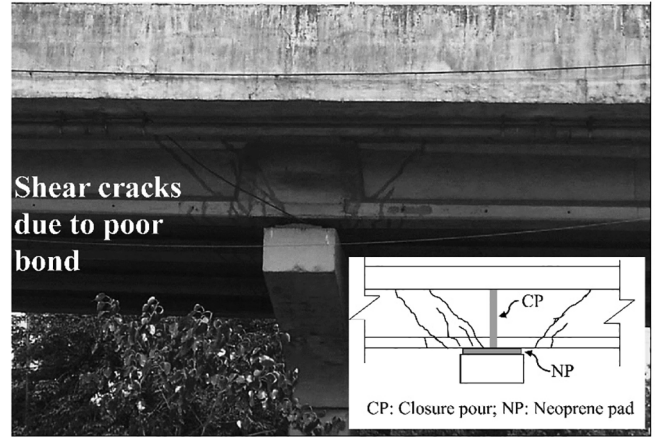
Shear cracks in a highway bridge girder.
